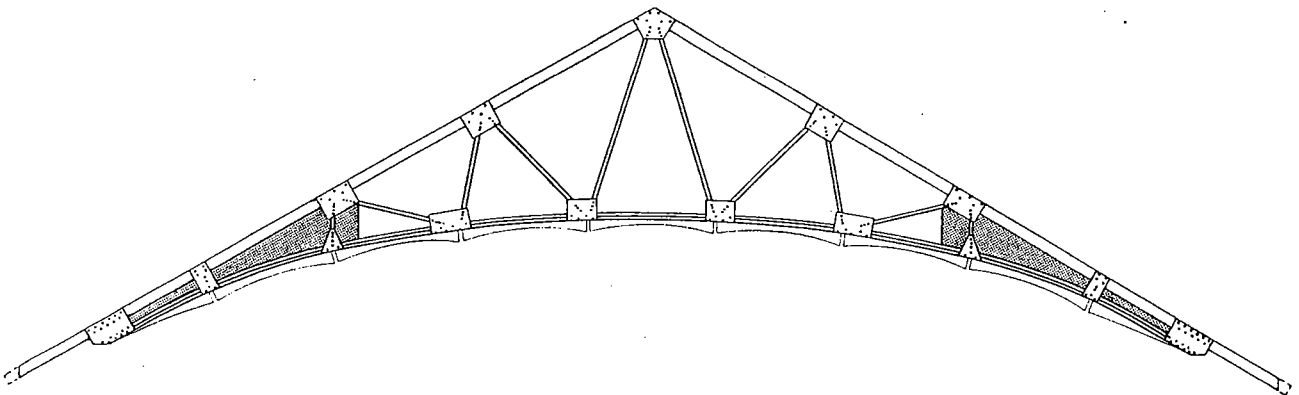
Truss of 25 ft span used in the roof construction. Timber: unseasoned hardwood, free of sapwood. Upper chords of 3 x 2 in., other members of 2 x 1 in. Gussets: $\frac{1}{4}$ in. thick plywood on both sides at all joints, except large heel gussets which are on one side only.
